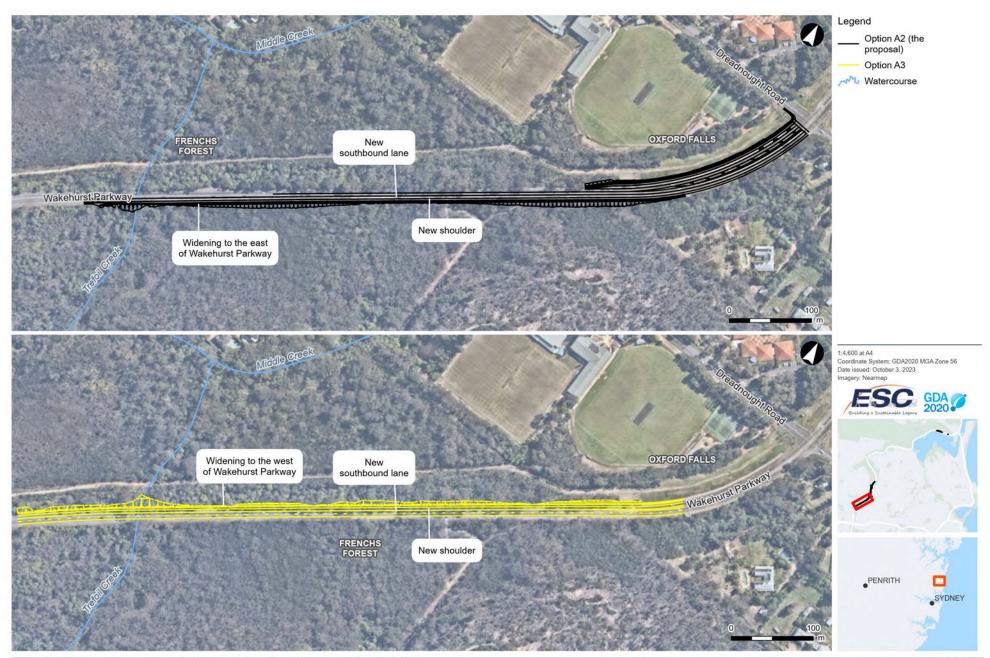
, Wakehurst Parkway from Trefoil Creek to Dreadnought Road - Options A2 to A3
